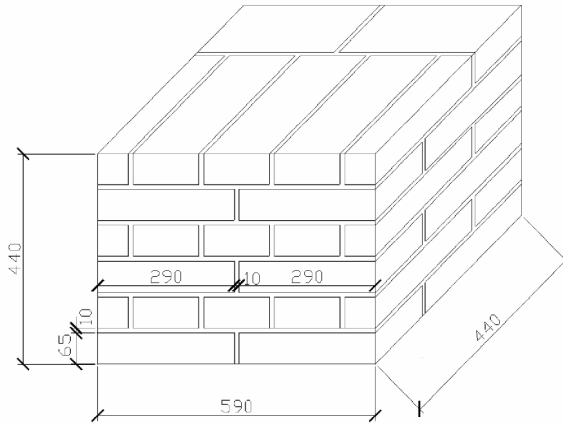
Scheme of the reference masonry wall (dimensions in mm).
